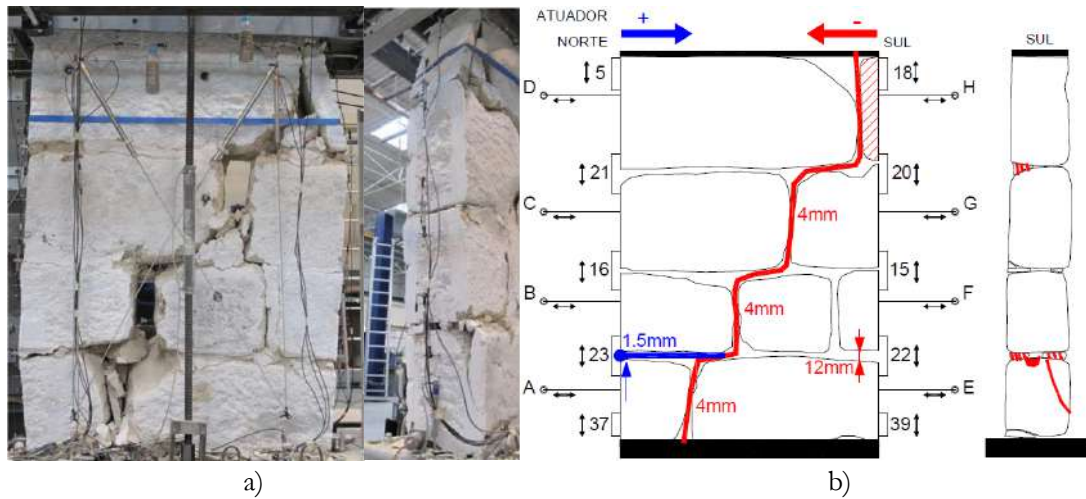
a) granite masonry panel collapsed after laboratorial test, b) schematic illustration of diagonal crack and instrumentation of granite masonry panel specimen [82]
